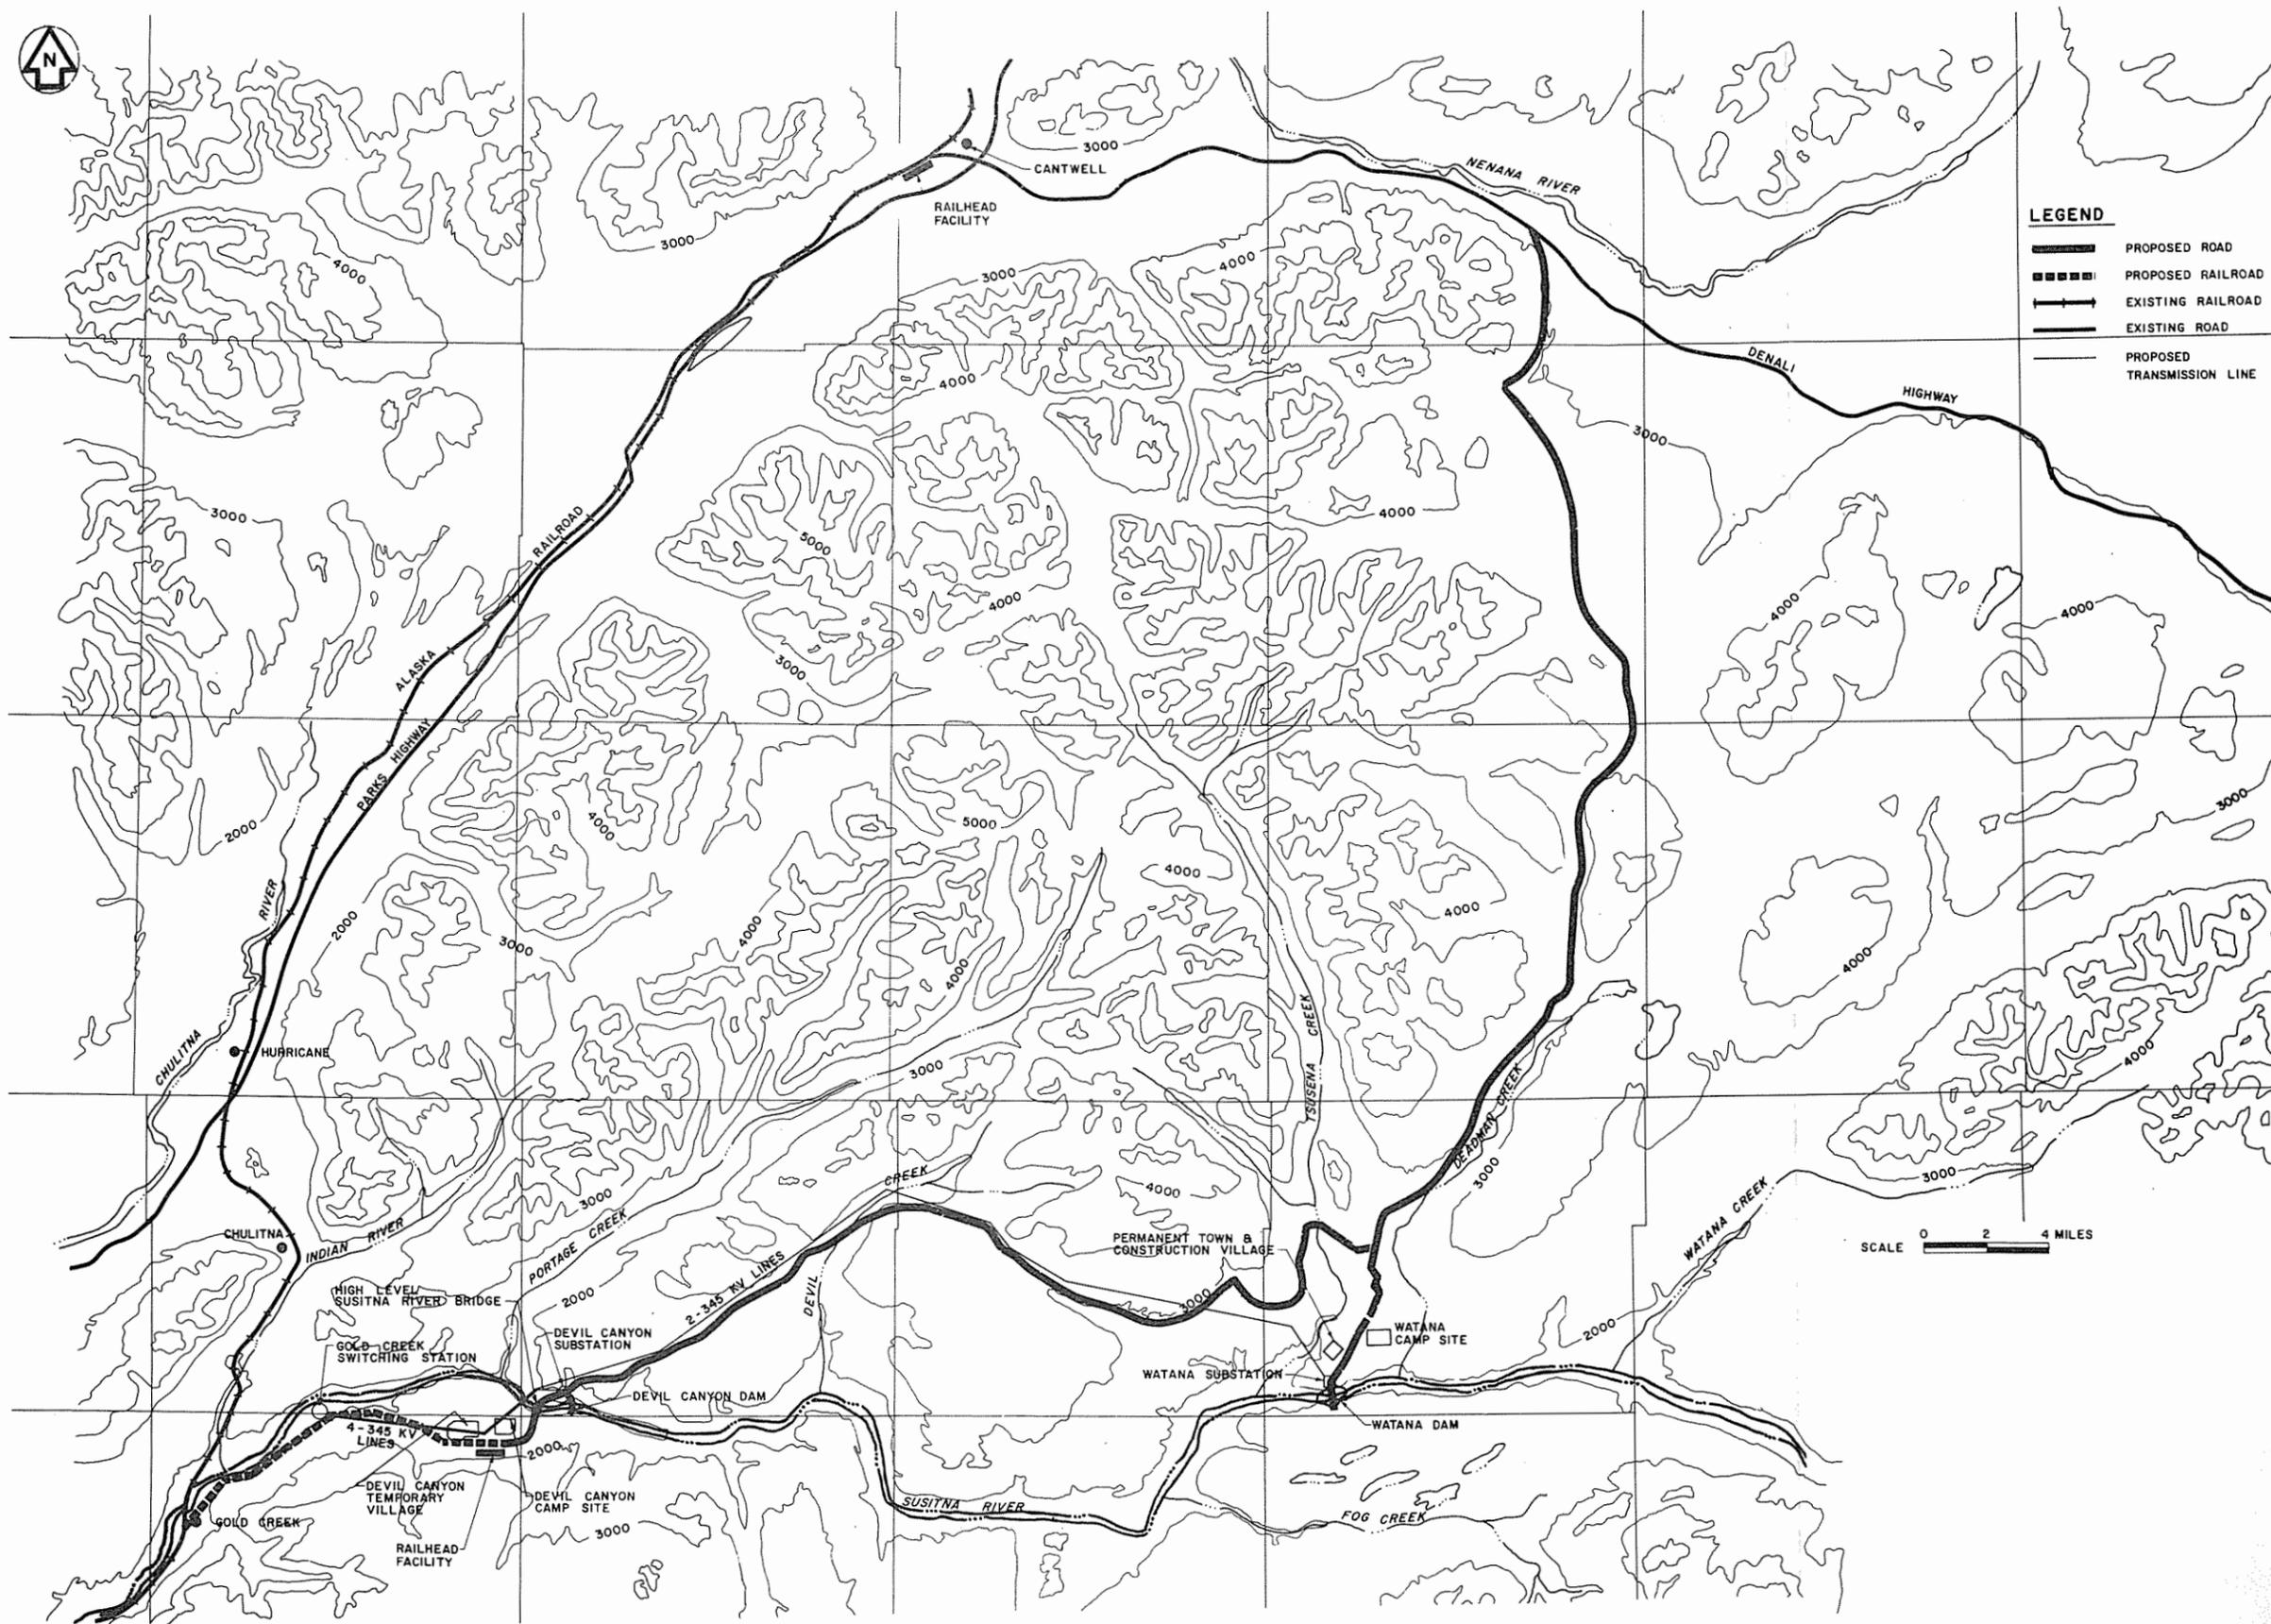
Plan of Proposed Access Routes. [Source: Application Exhibit F, Plate F32]
